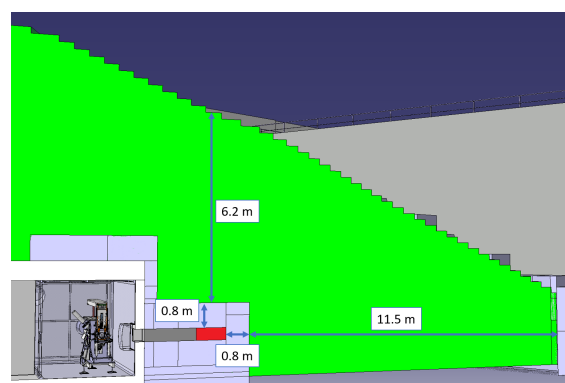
Section showing the HRS dump in red, the concrete blocks surrounding it in grey, and the soil in green.
